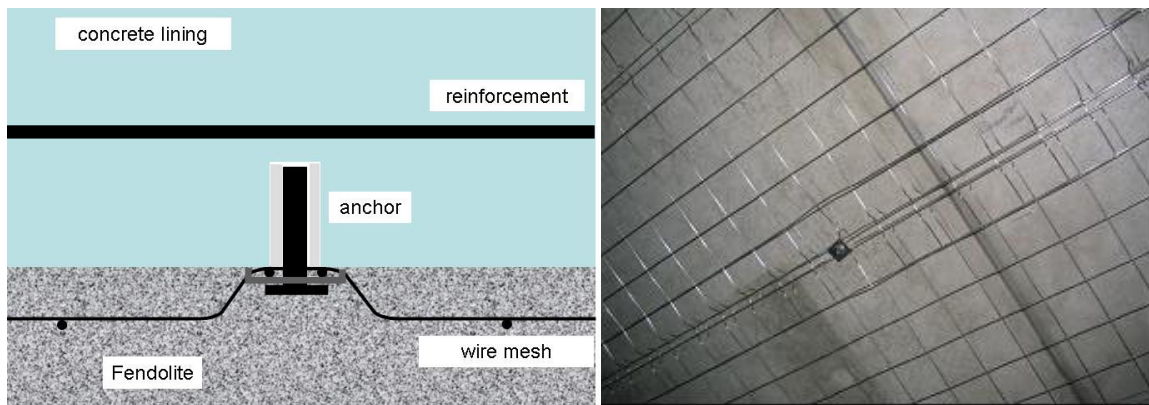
Detail of the fire protection lining (left) and anchored wire mesh fixed to concrete lining before spraying (right)
